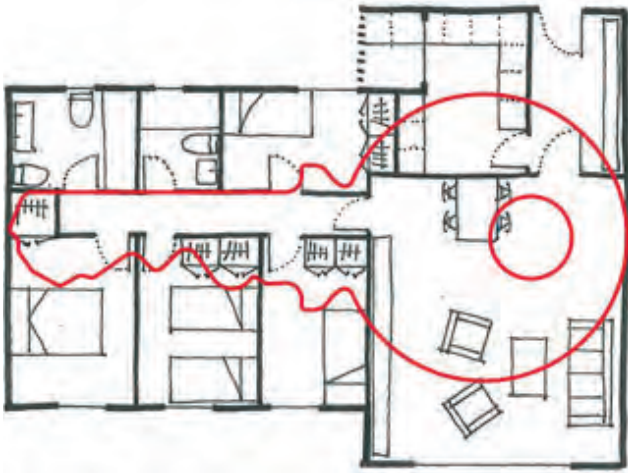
Typical plan from a 1960s apartment building in the Sants neighborhood (Barcelona).
